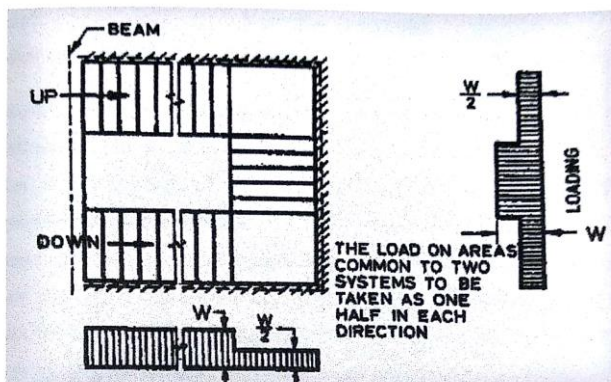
LOADING ON STAIRS WITH OPEN WELL
